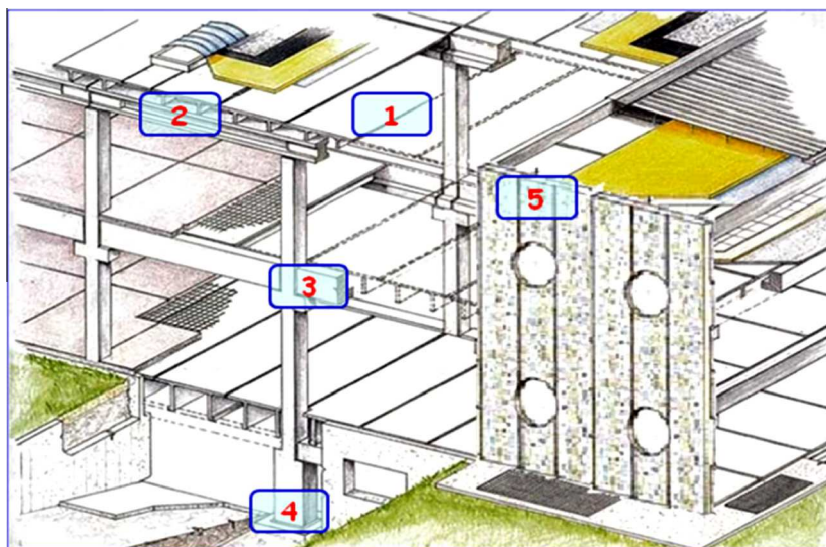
Categories of connections between the different structural elements of a precast concrete building.
